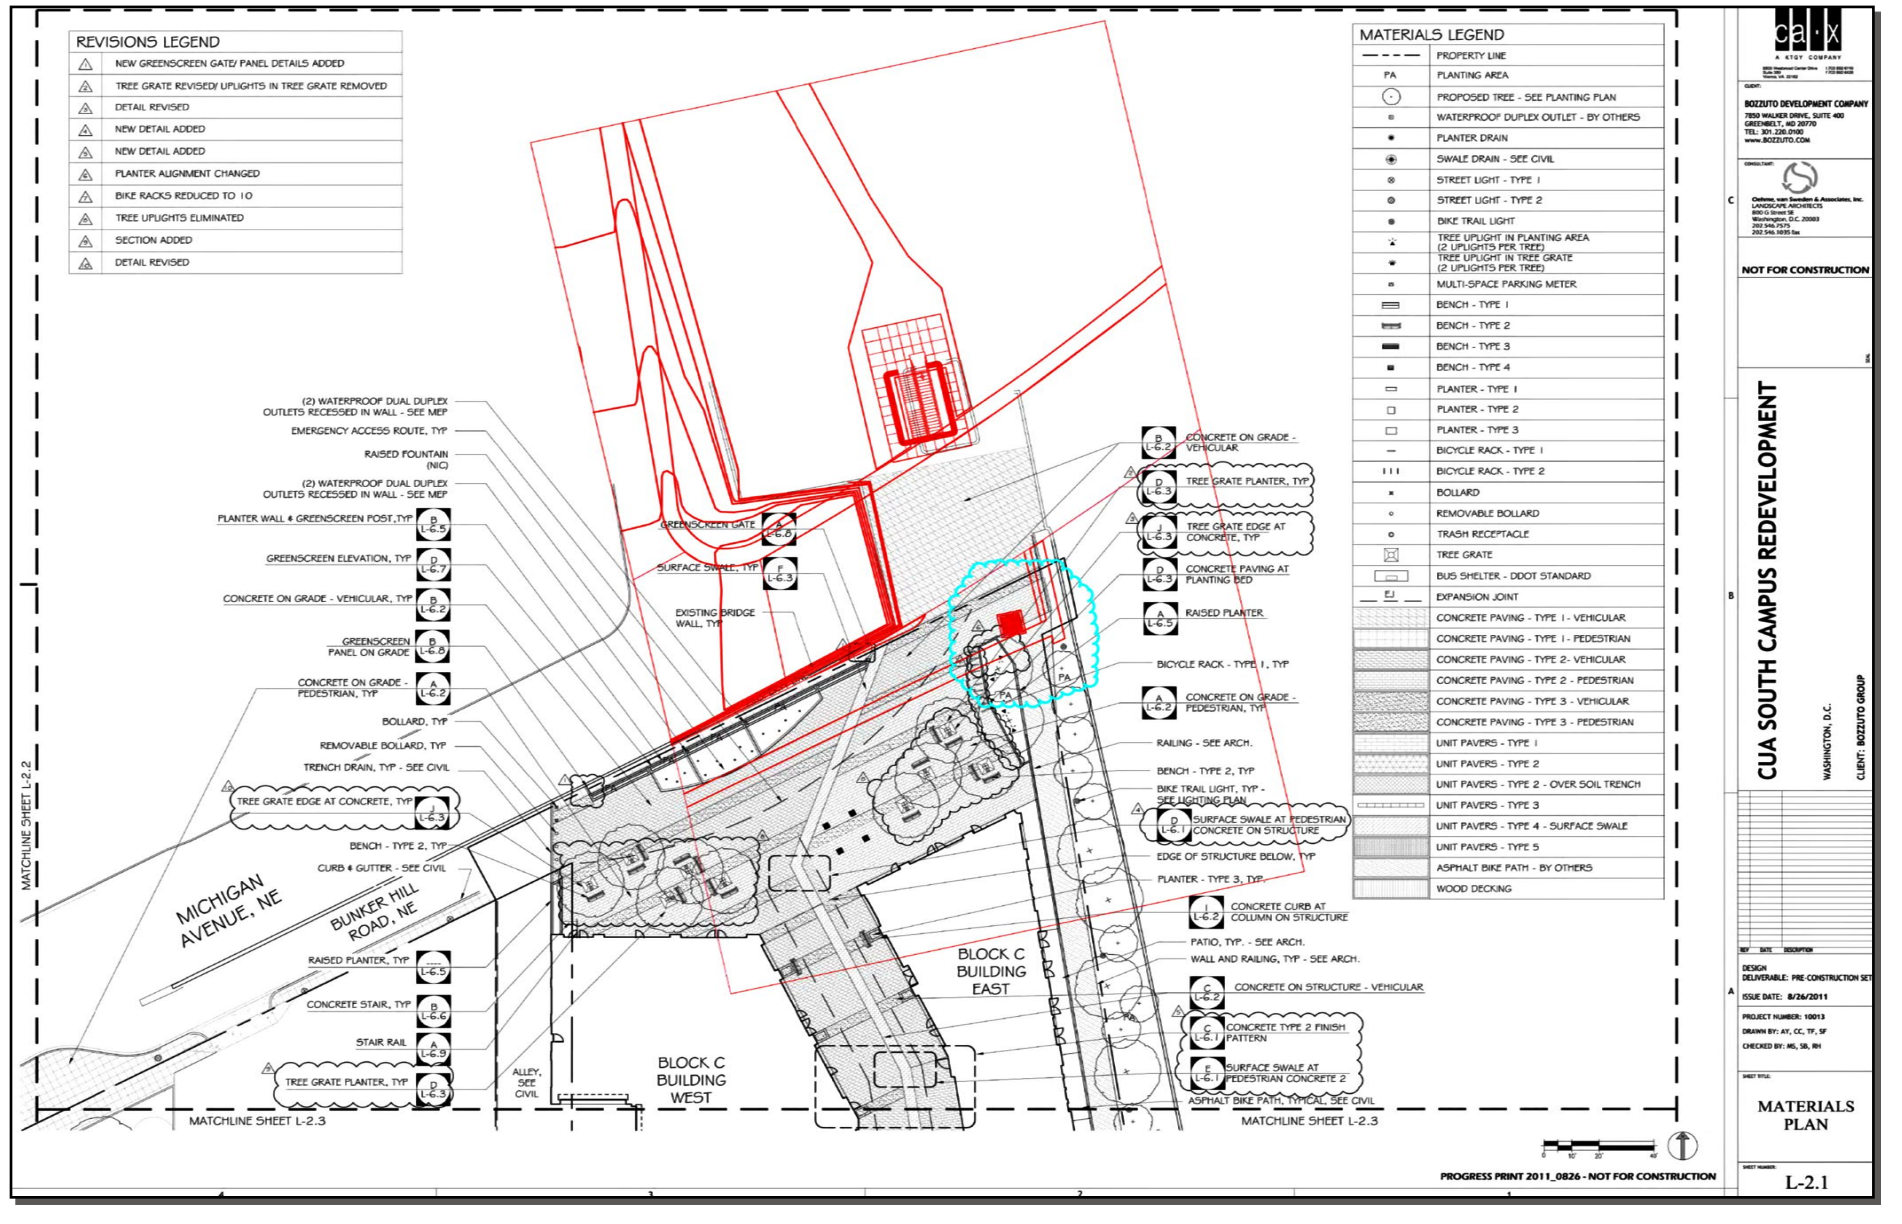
Option 3B Plan Drawing (Entrance Level)
